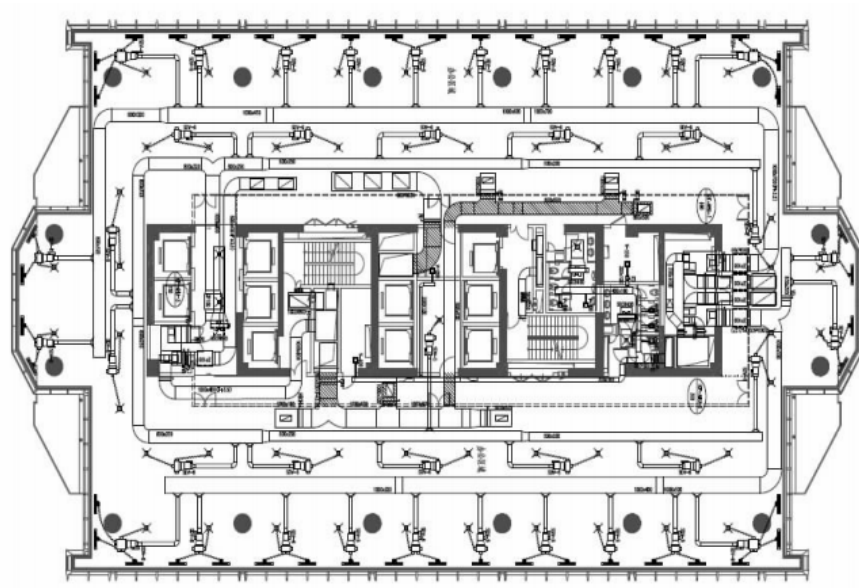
Air conditioning and ventilation plan at the top of standard tower
